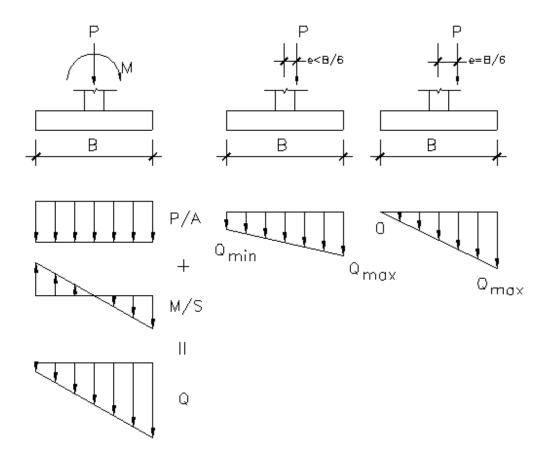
Footing pressures with eccentricity not more than 1/6 footing width
